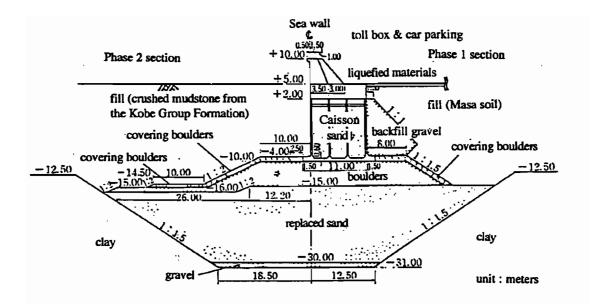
Cross-section of the caisson walls between Phase 1 and 2 of Port Island (Konoike, 1996)
